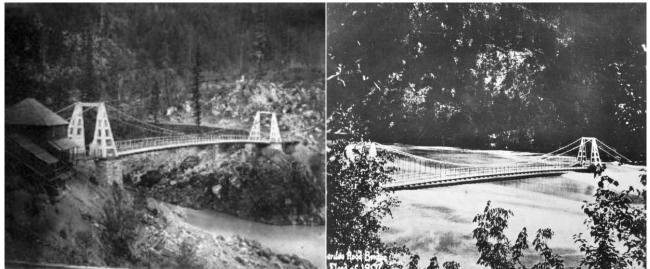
Alexandra Suspension Bridge (1868) Fig. 9. Bridge during the 1894 flood
